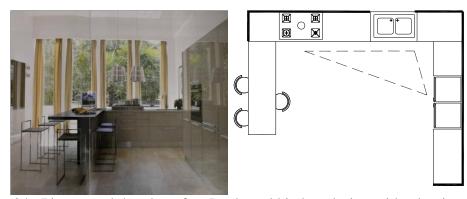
Picture and the plan of an L- shaped kitchen design with a bar installment: (Asensio, 2006)
